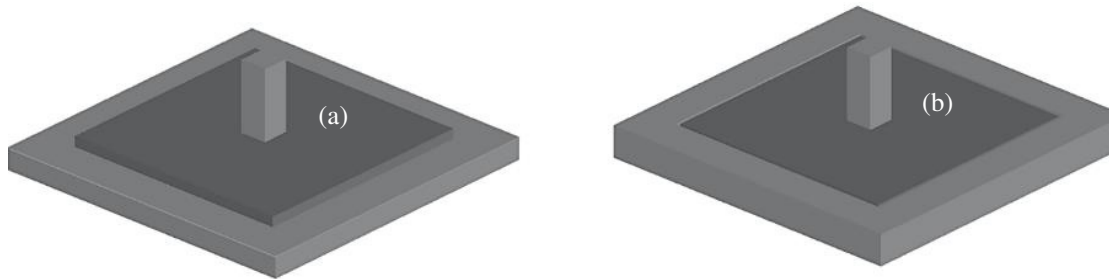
RCO strengthening technique: a) Protruding from the existing slab (removal of concrete cover only); b) Embedded in the existing slab due to large concrete cover.
